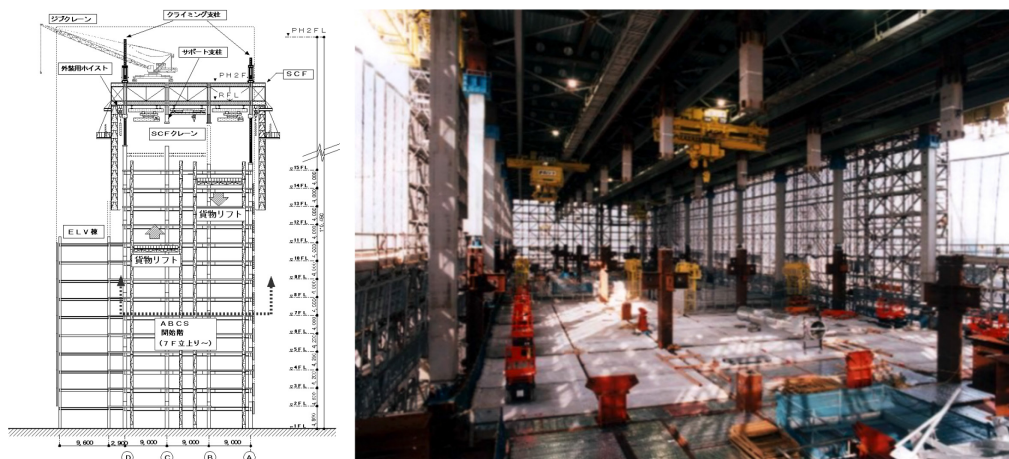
“Automated Building Construction System” (ABCS) by Obayashi Corporation: (left) Cross section of ABCS system applied to a 26 story office building. The system was applied for all standard floors from the 7<sup>th</sup> floor upwards. The uppermost floor is enclosed by a so called “Super Construction Factory” (SCF); (right) View inside the SCF, which establishes a controlled environment for the automated construction work like material transport and welding.
